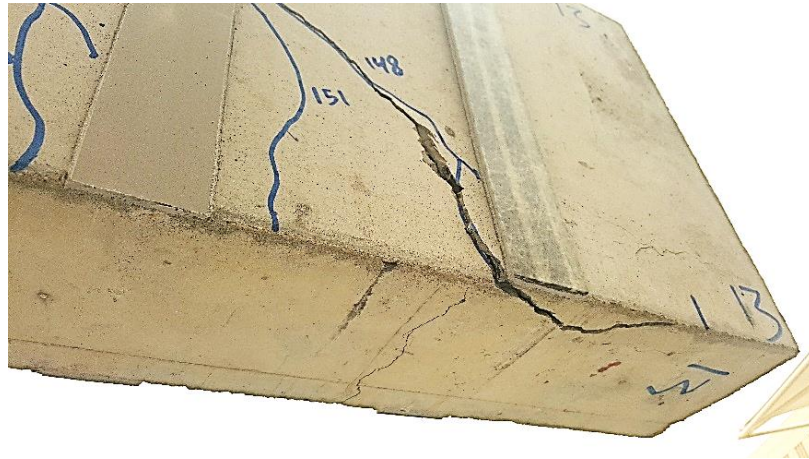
Crack pattern and failure mode for EB specimens (Front view).
